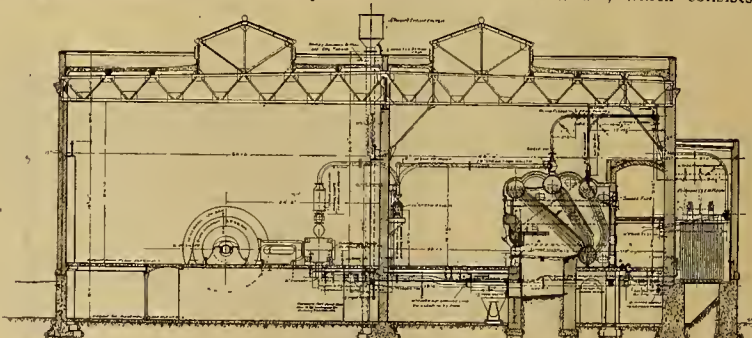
SECTIONAL ELEVATION THROUGH GRAND FORKS STATION
